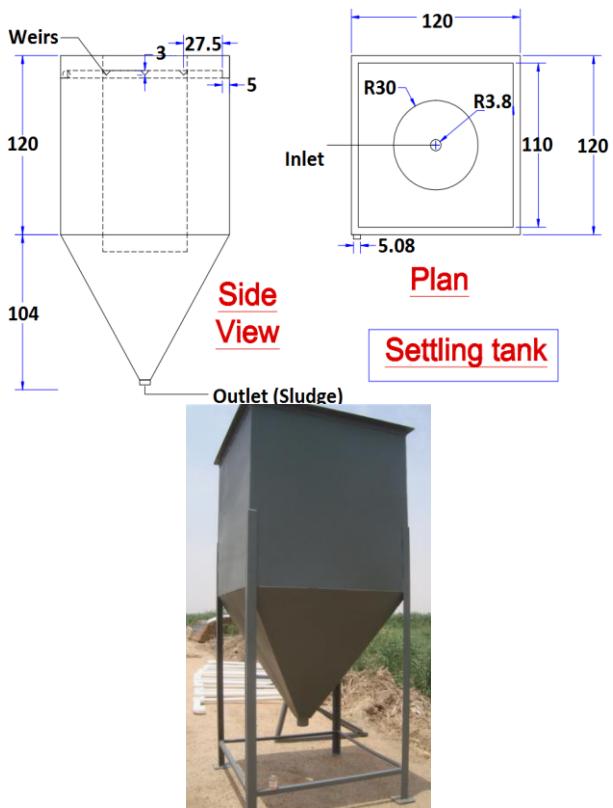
Design of Vertical Settling Tank (dimensions in cm)
